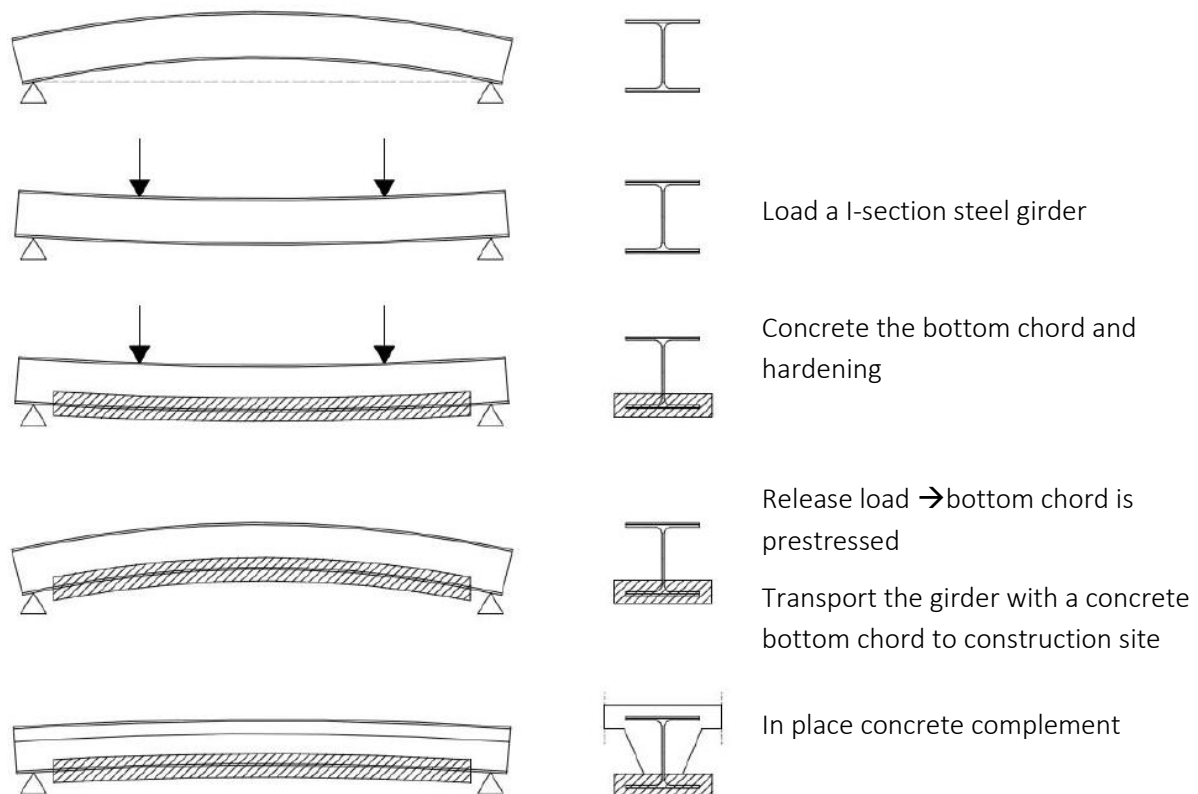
Preflex girder principle [C+P Brückenbau GmbH & C. KG, Bad Homburg]
